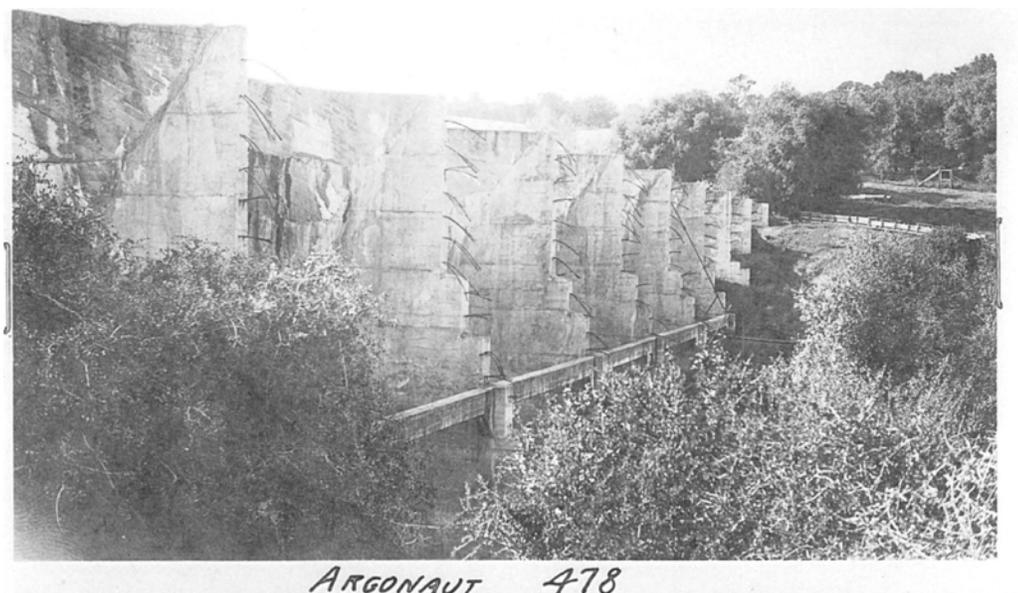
View from Downstream Right Abutment Looking Towards Left Abutment (1931).
